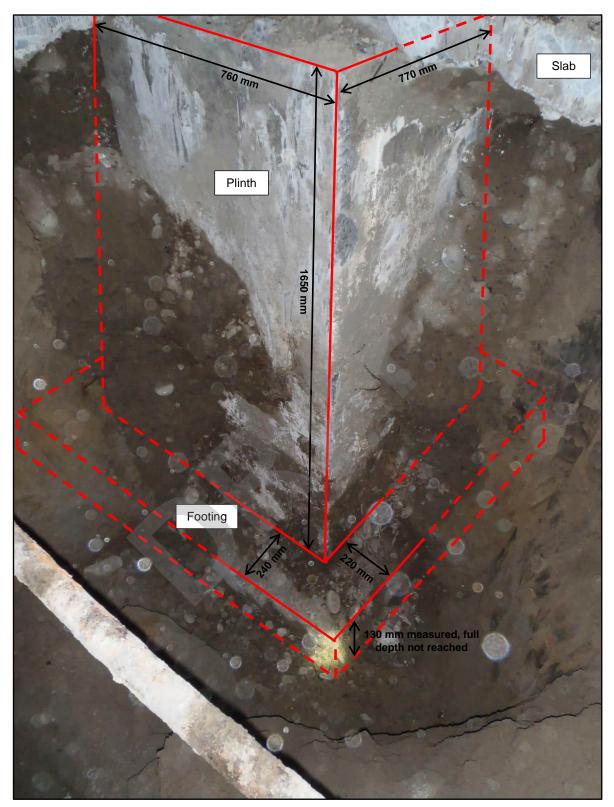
Column C7 footing geometry facing north-west. All measurements are approximate.
